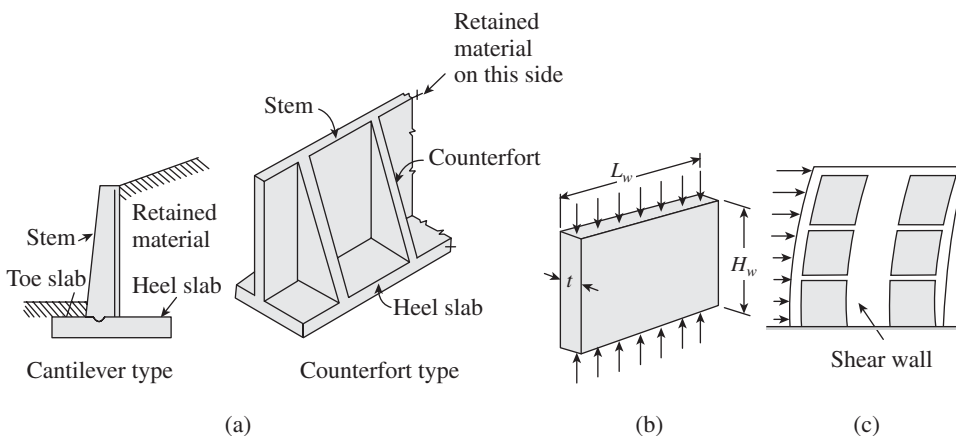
Types of RC walls (a) Retaining walls (b) Load-bearing wall (c) Shear wall
